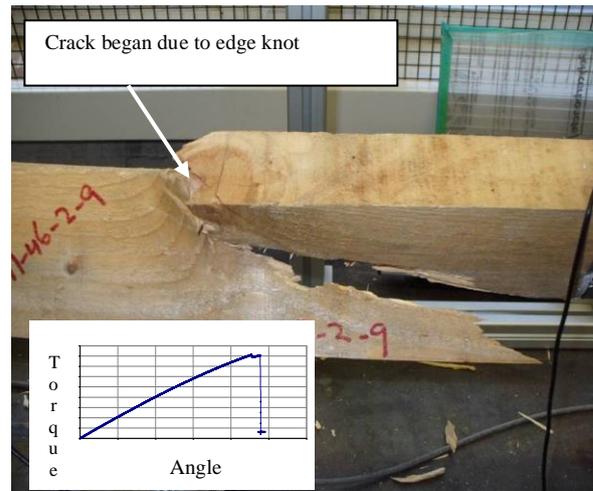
A typical shear failure began due to an edge knot in 3.6m joist
